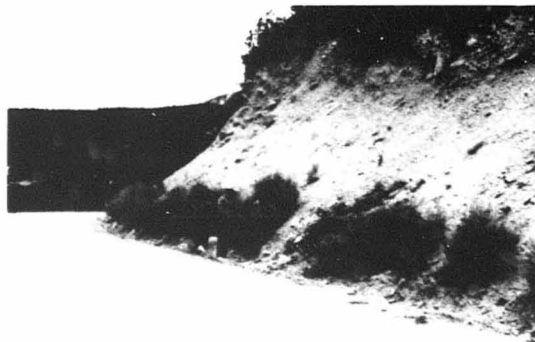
Oldman wormwood cuttings growing along base of steep, barren roadcut along Ephraim Canyon Road (note soil building up behind plants). These were planted in 1975. Sanpete County, UT.
